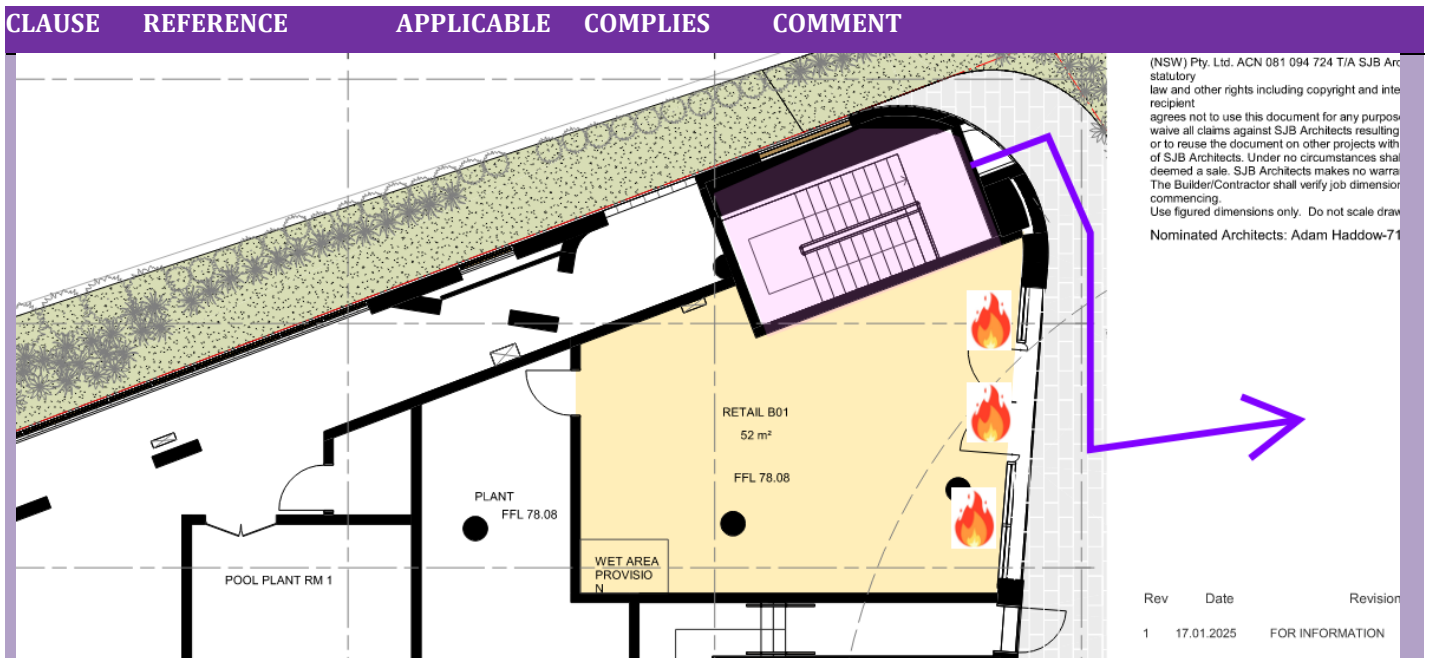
Tower A discharge of fire isolated stairs (Oxford Street Tower)
